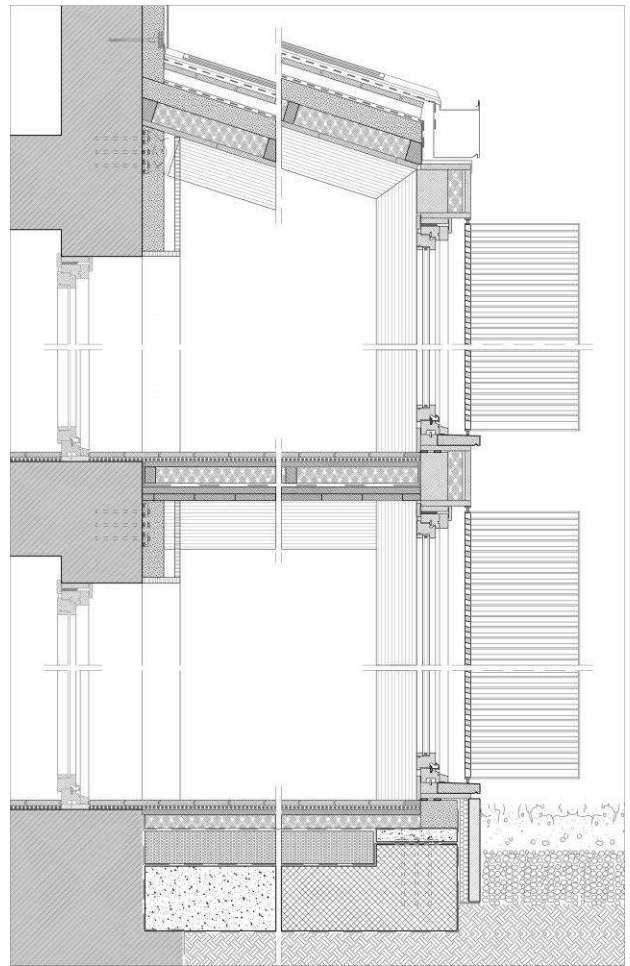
Cross section of the building envelope after interventions following scenario B. The main structure is a wooden skeleton, the side elements of the addition consist of pre-assembled insulated panels and the main facade is a double-glazing wall shaded by a wooden brise-soleil.
